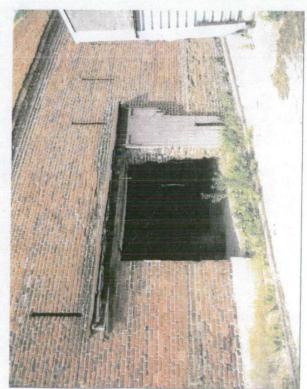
South elevation of main barn, showing doorway and more modern sliding door.
